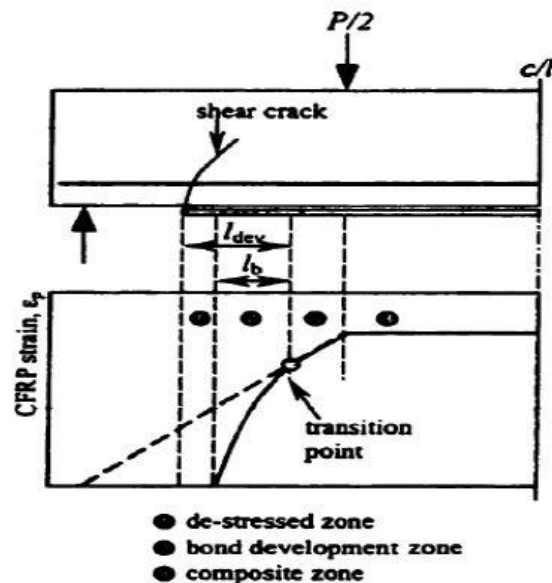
Composite model of externally-bonded FRP concrete beams (Ngujen, et al., 2001)
